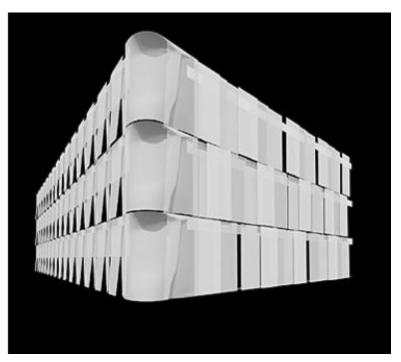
Fabric wall design Tall building application showing the open corner allowing for natural ventilation for cooling.
